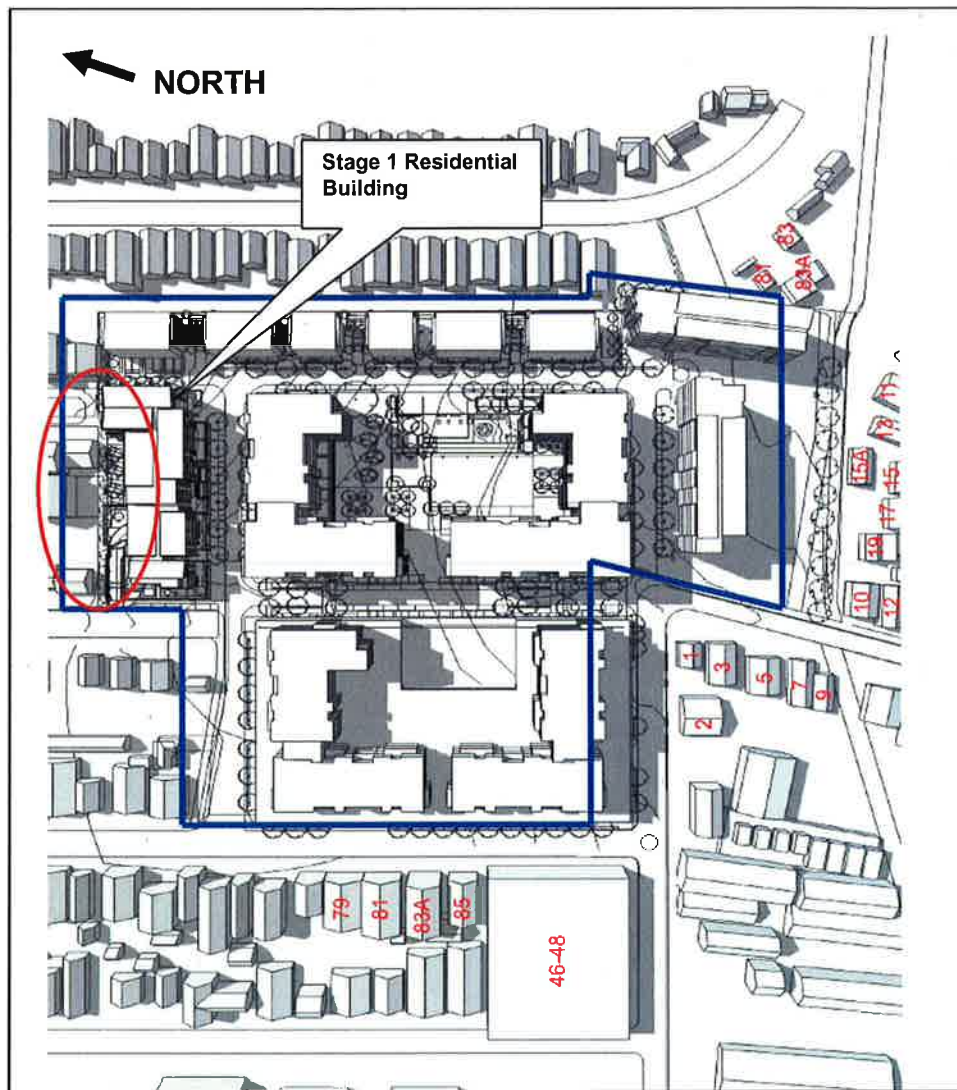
Approved Built form – Concept Plan (blue) and location of the Stage 1 Residential Building (red).
